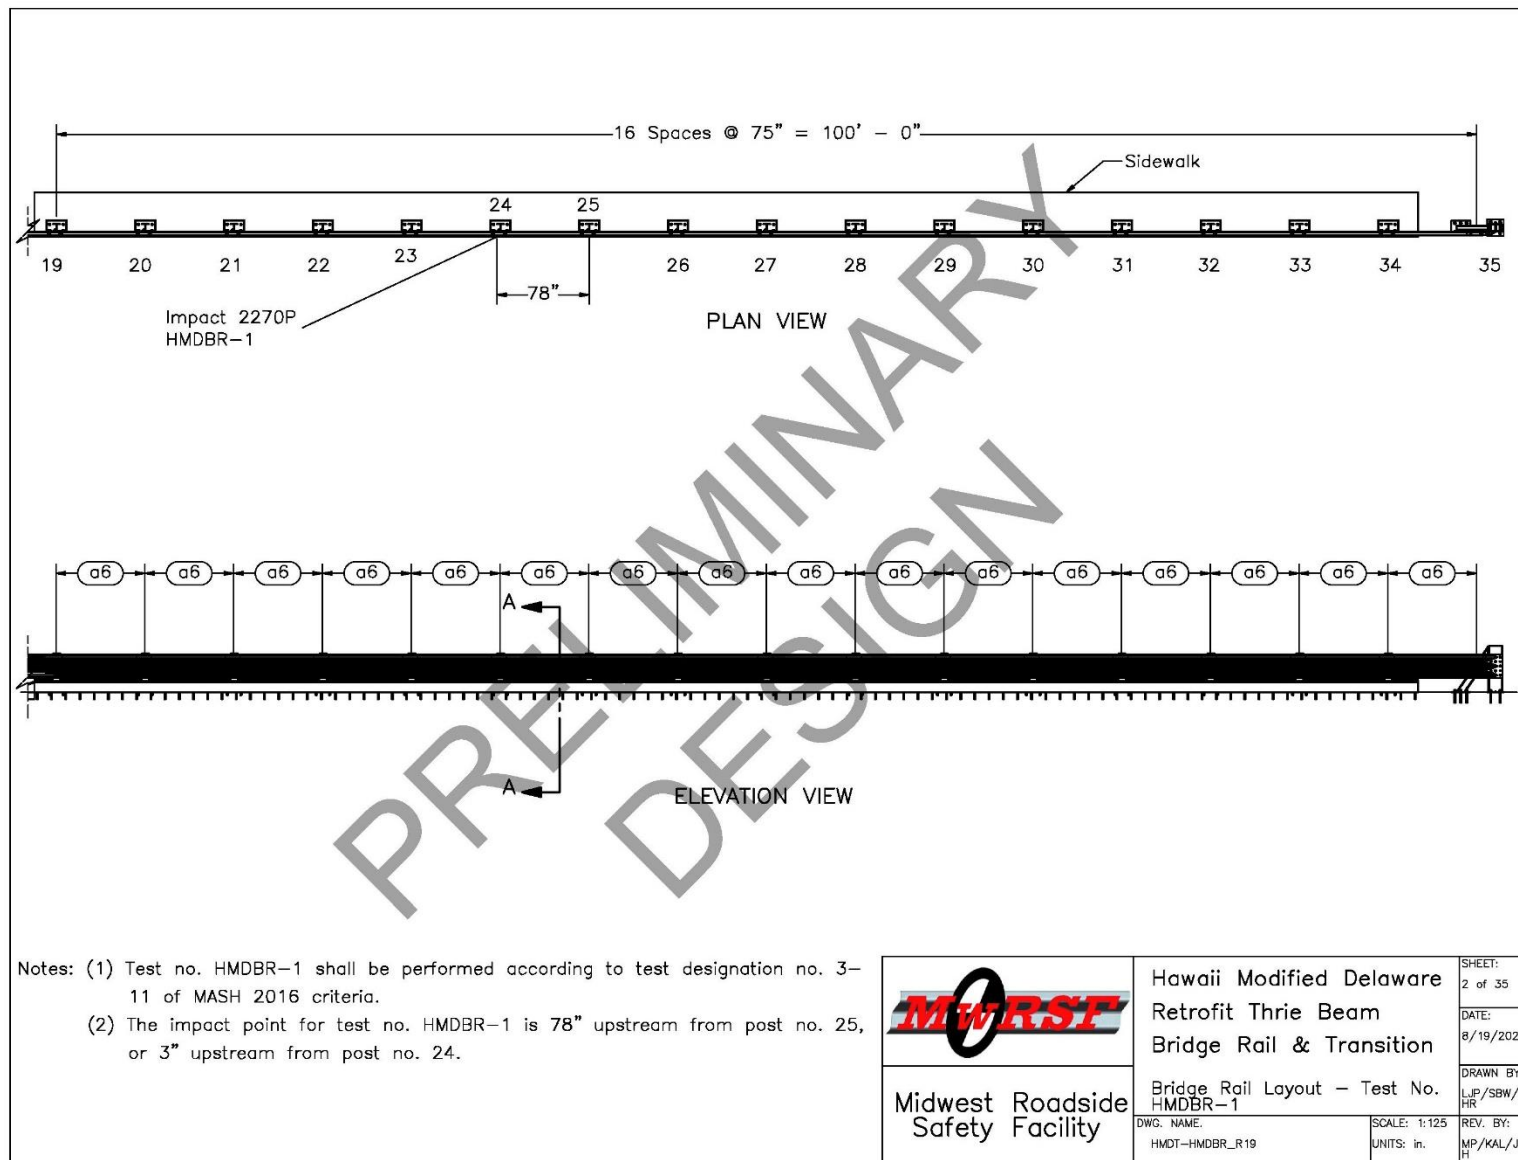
Bridge Rail Layout, Test No. HMDT-1
